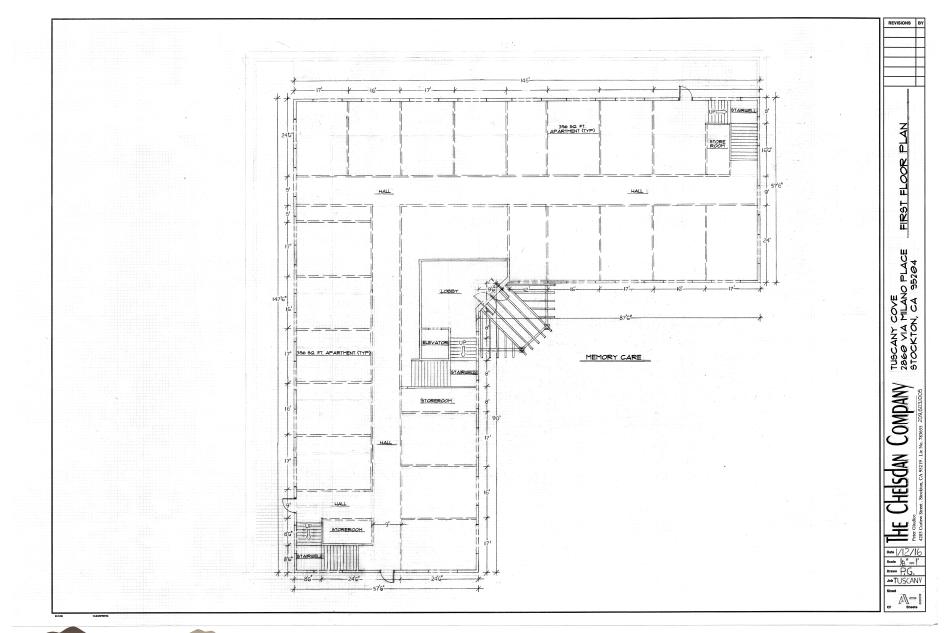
MEMORY CARE BUILDING, FLOOR 1
